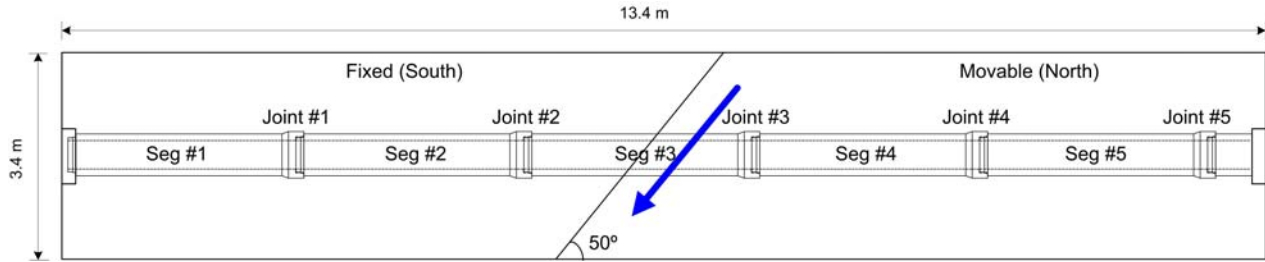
Layout of the segmented concrete pipeline in the Cornell Lifeline Experimental and Testing Facility's test basin.
